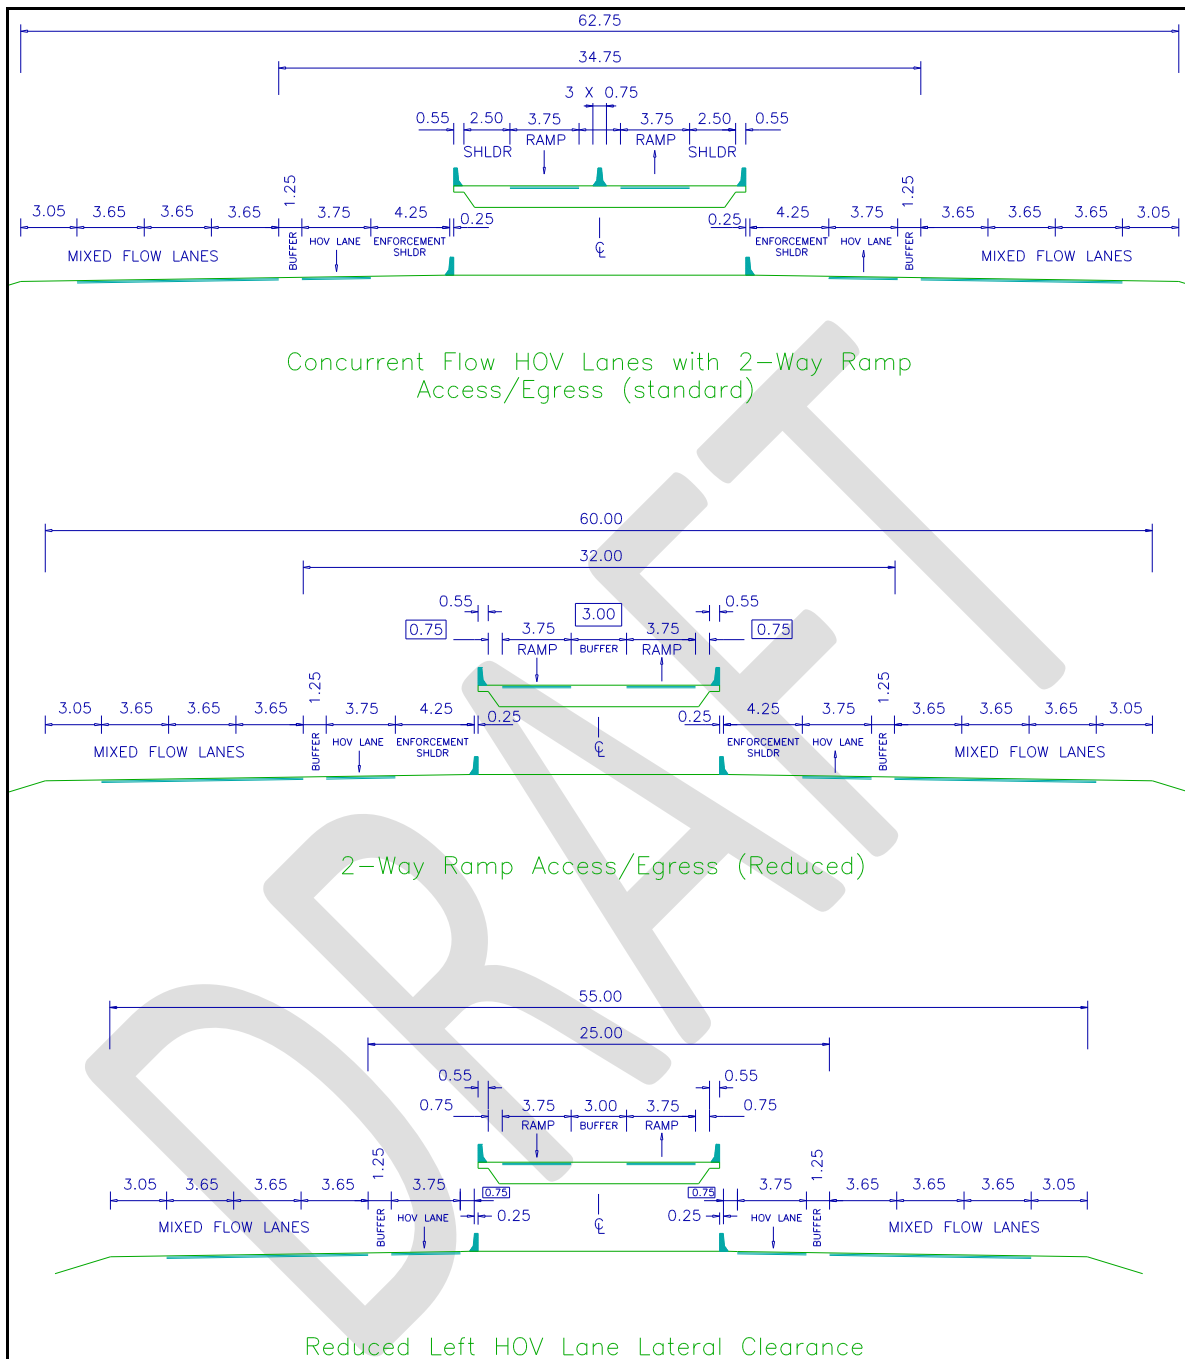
Median HOV Two-Way Ramp Cross-Sections
